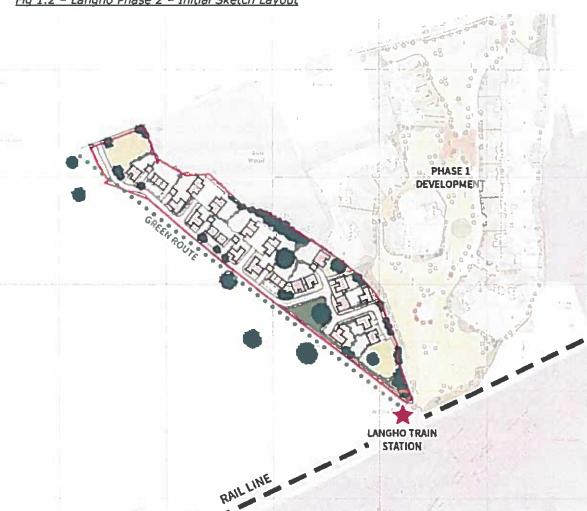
Langho Phase 2 - Initial Sketch Layout
